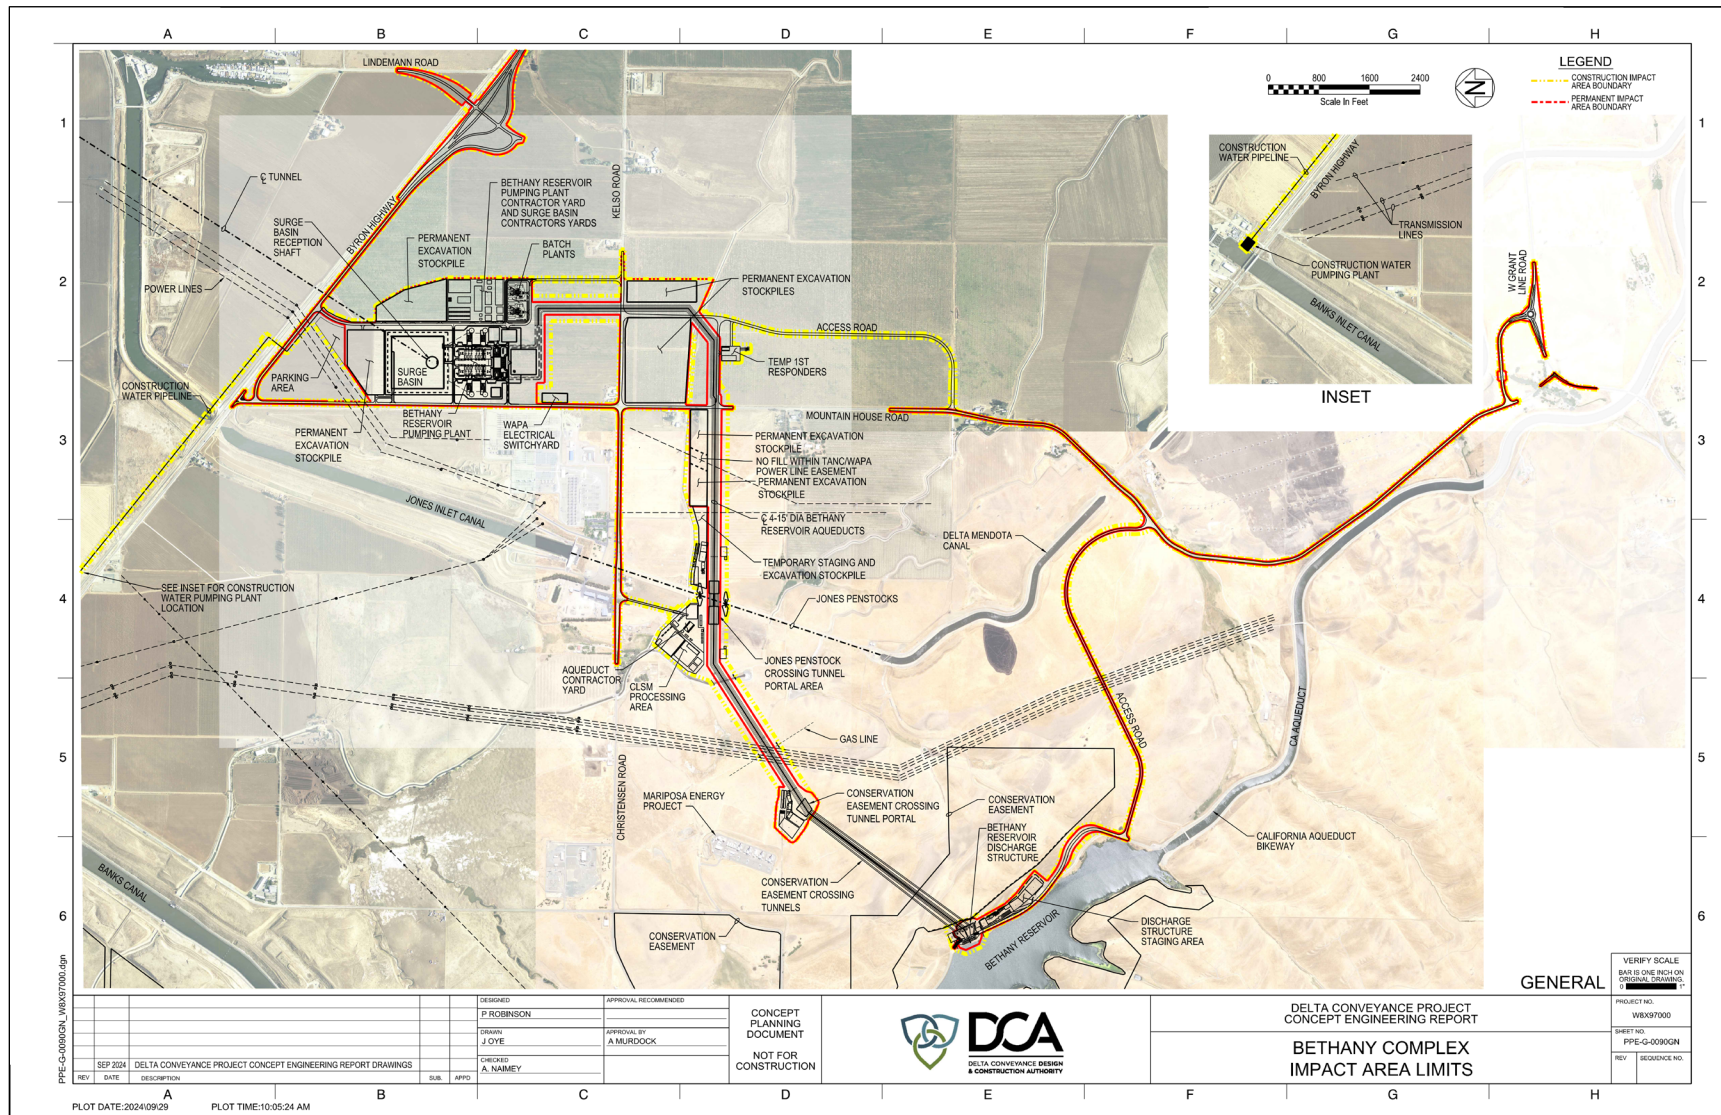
Bethany Complex Facilities Site Plan with Construction and Permanent Boundaries
